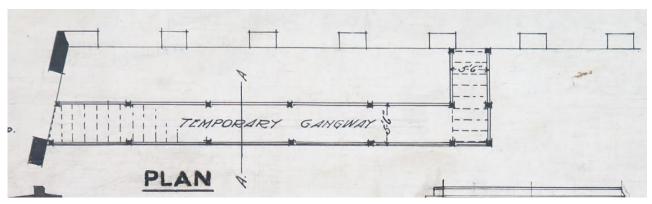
1916 George McRae proposed Plans – Elevation of temporary gangway Source: State Records NSW, PB25/4110, dated 1916
